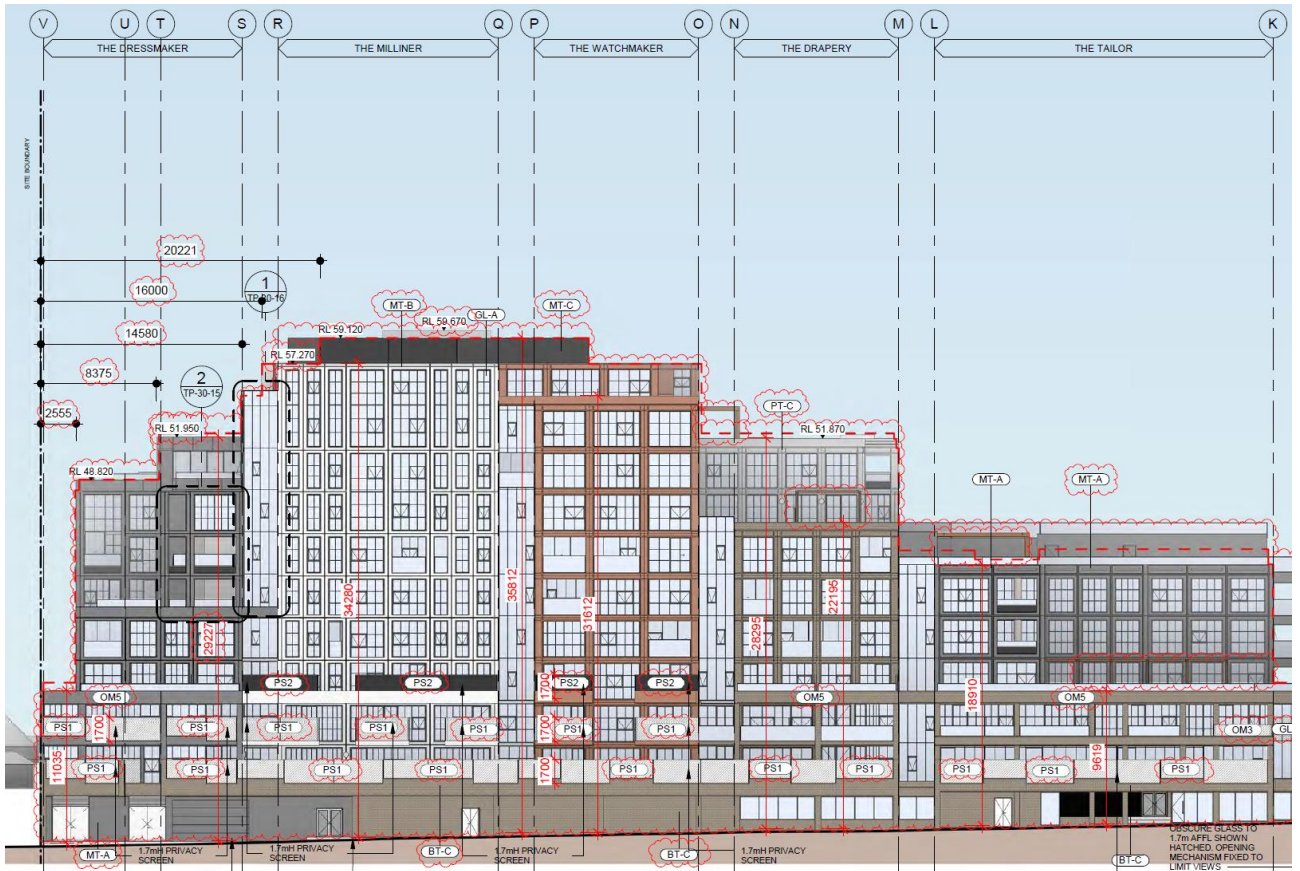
Proposed laneway (east) elevation (Grid V to Grid K)
